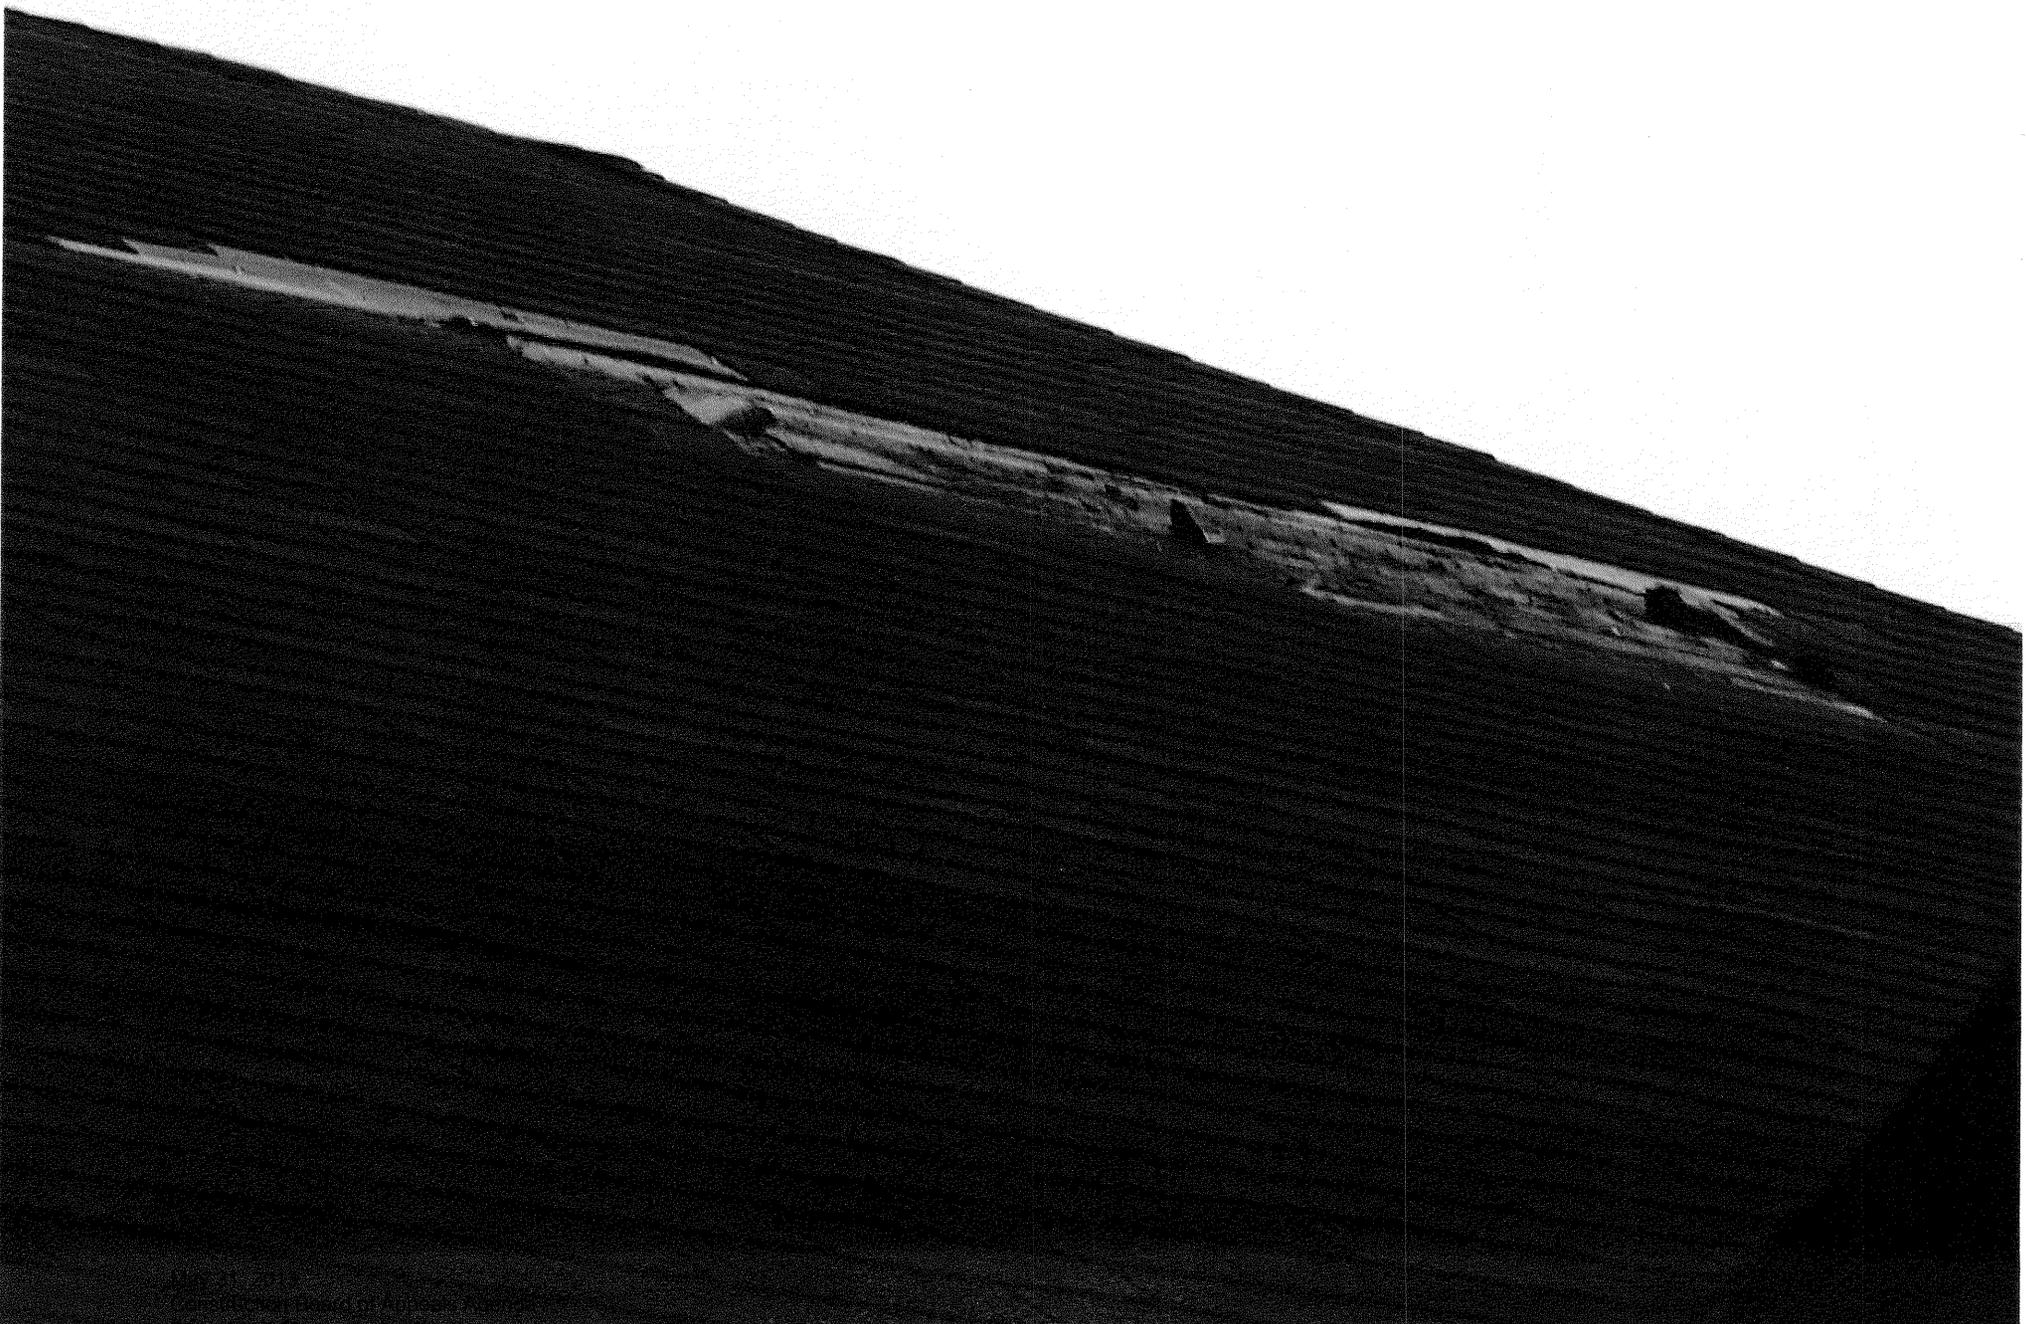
North, East side of church is the best side of this building. Small amount of roof damage with small amount of peeling paint. Minimal damage on siding.
